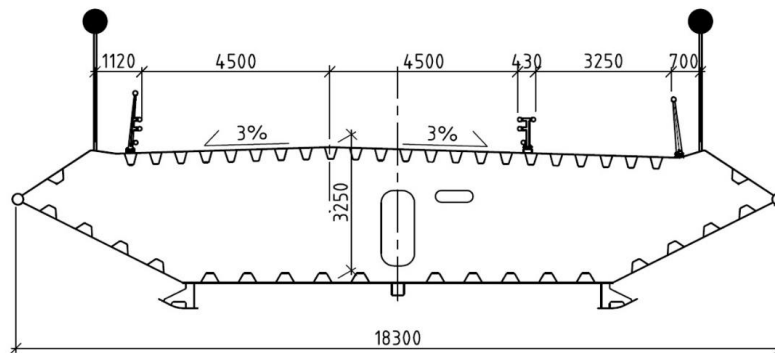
Technical drawing of the Hardanger Bridge deck cross-section, all units in mm (courtesy of NPRA)
